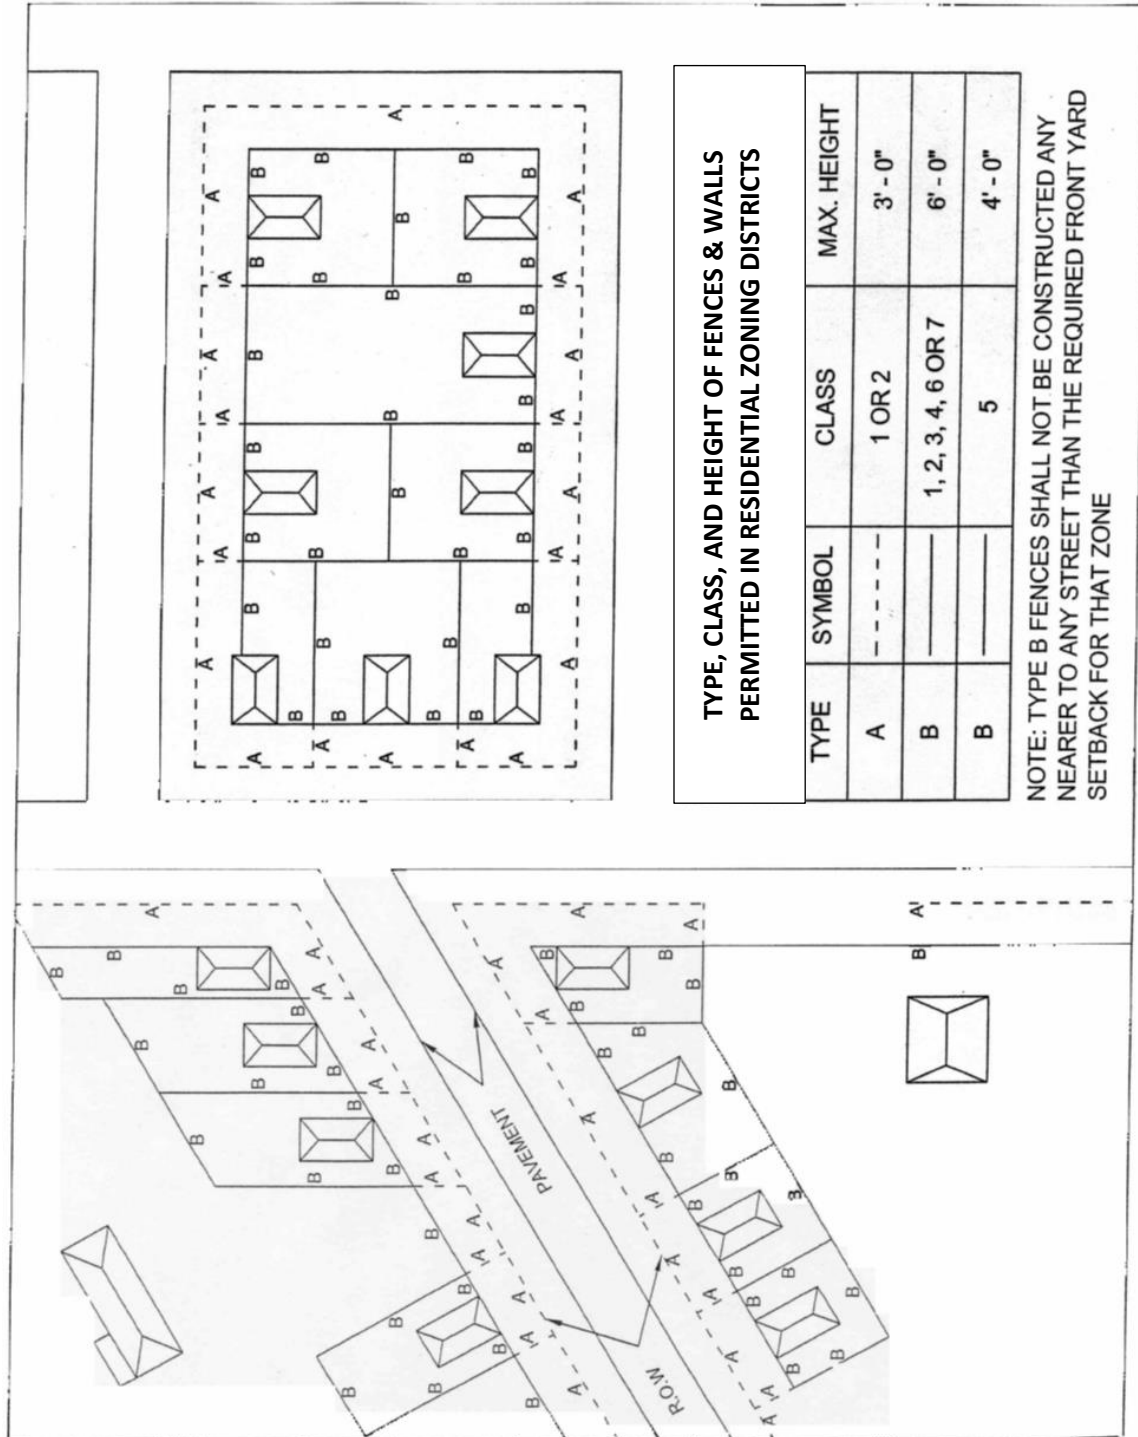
TYPE, CLASS, AND HEIGHT OF FENCES & WALLS PERMITTED IN RESIDENTIAL ZONING DISTRICTS
